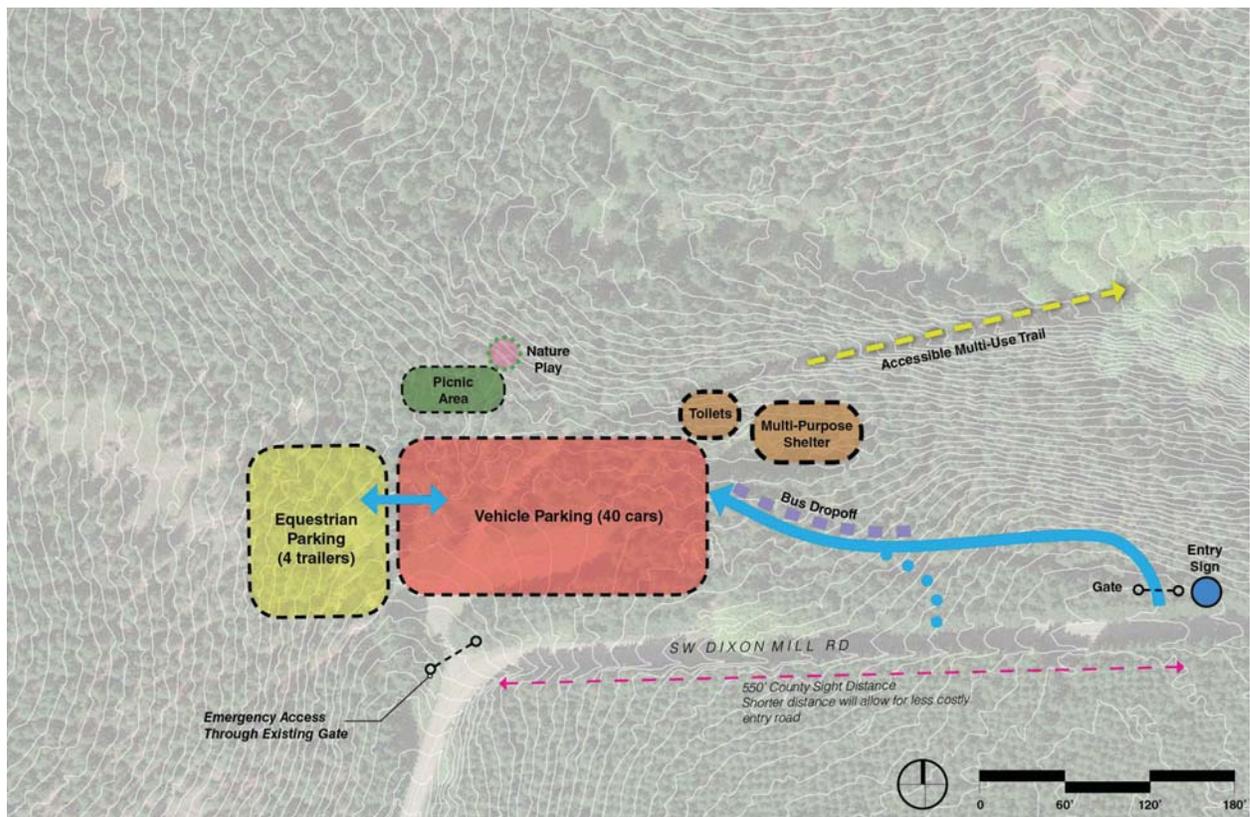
Diagram of potential features and amenities at the trailhead off Southwest Dixon Mill Road.
